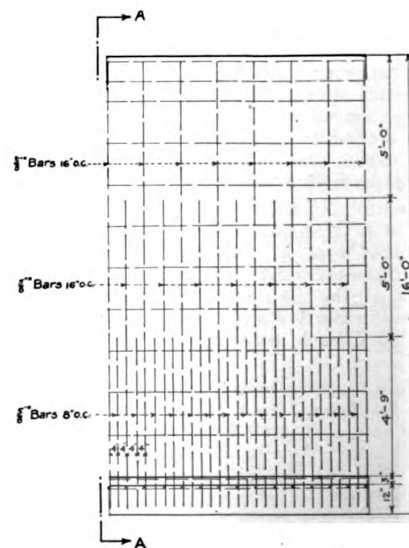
Elevation of retaining wall. This shows placing of reinforcement as finally calculated.
